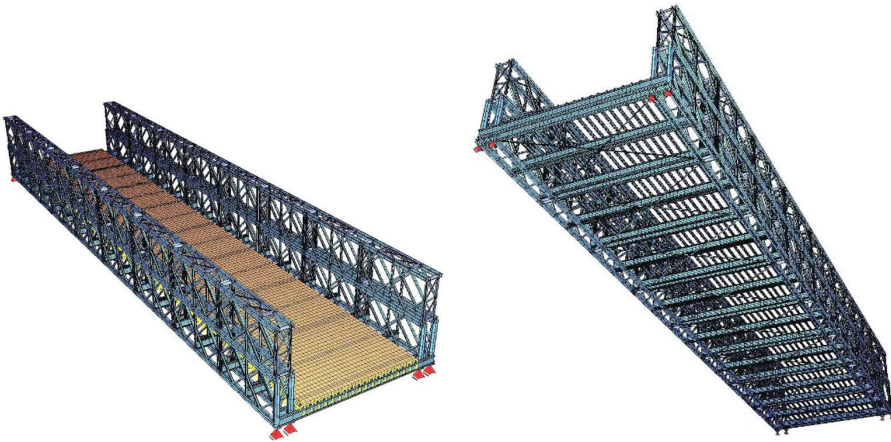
Visualization 3D model – lattice girders with rigid, non-flexible nodes, platform and bracing elements
